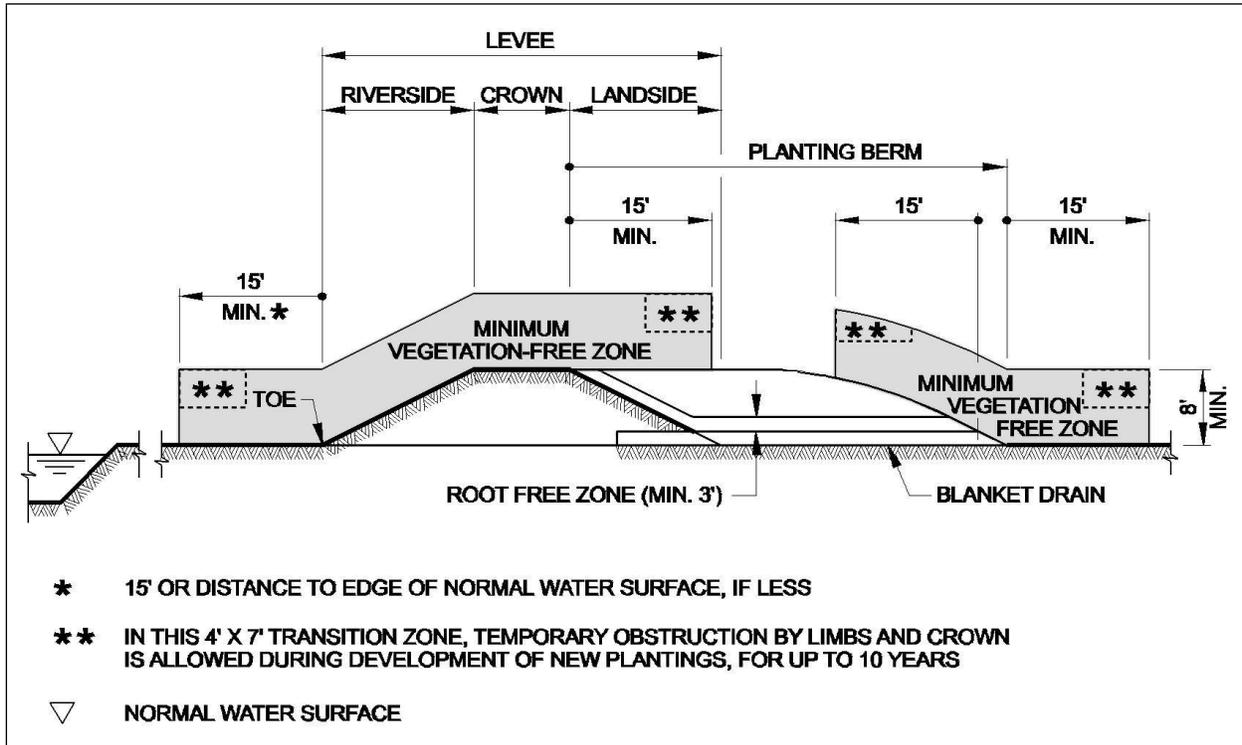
Levee Section with Planting Berm and Blanket Drain.
